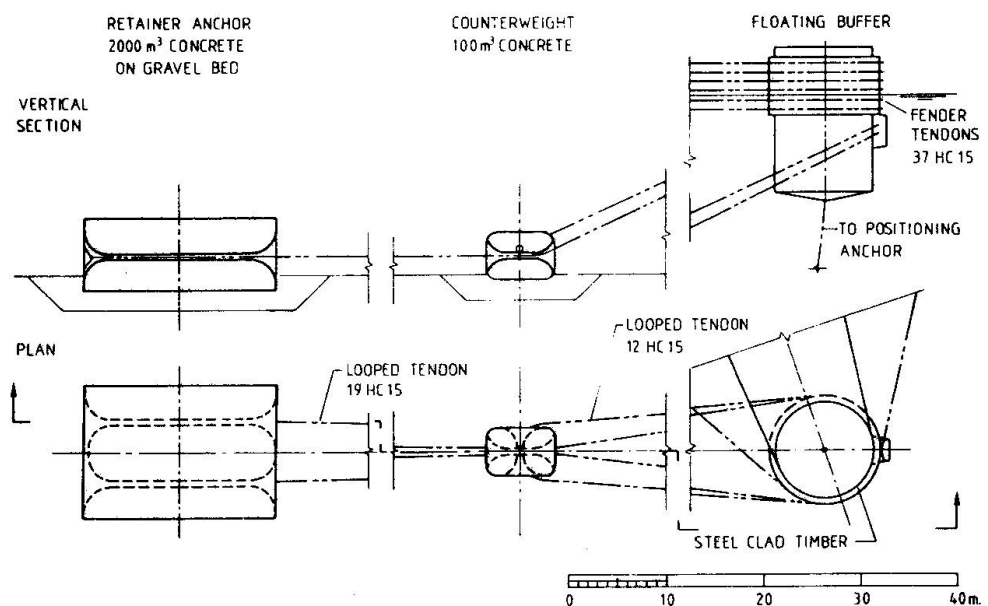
Floating protection. Details of tendon arrangement, counterweight and retainer anchor. Ex : (Z B L.)
